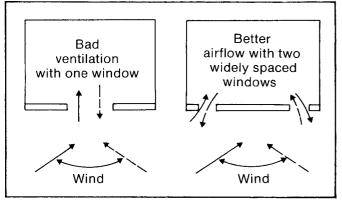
Two Windows Ventilate Better Than One in Rooms With One Outside Wall
